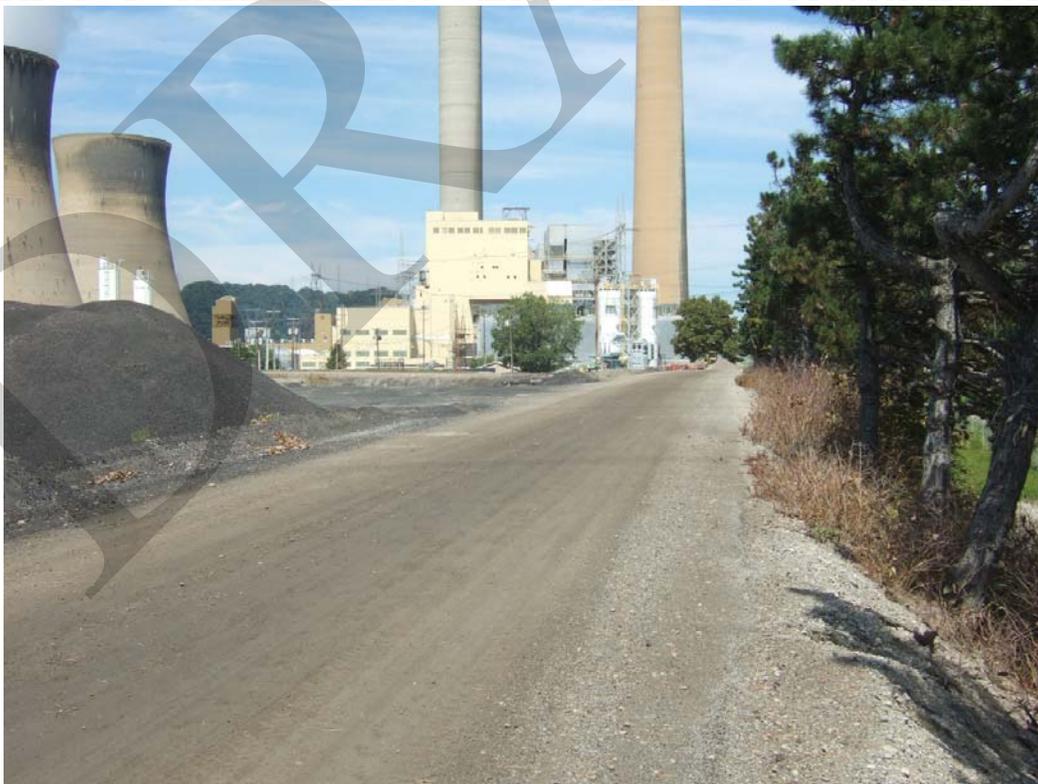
EAST UPSRTREAM SLOPE OF BOTTOM ASH POND
